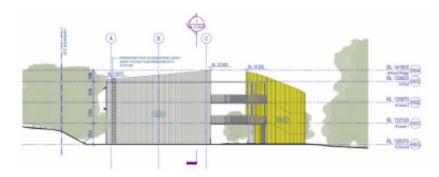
Northern elevation of the new classroom building Source: Woods Bagot, 2022
